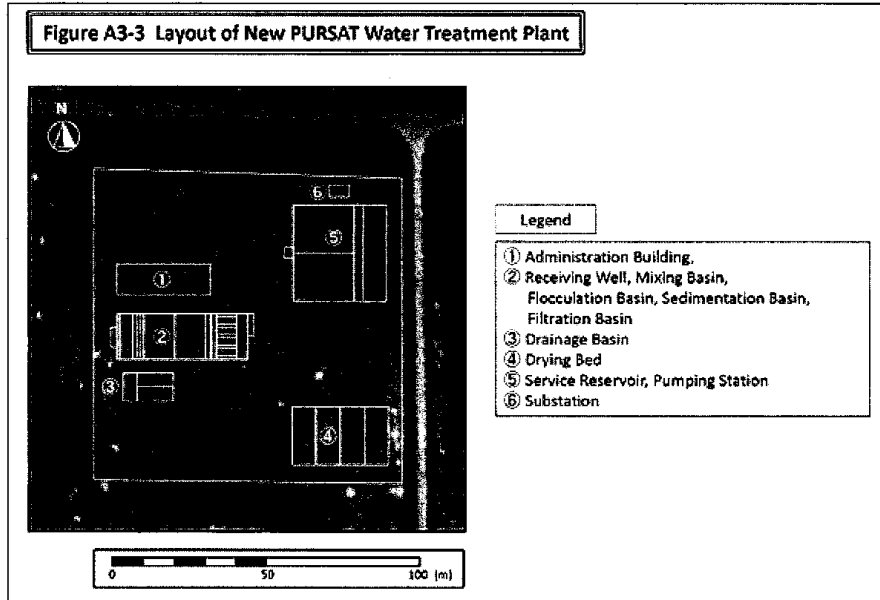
Layout of New WTP (one of the alternative layouts) ៦
